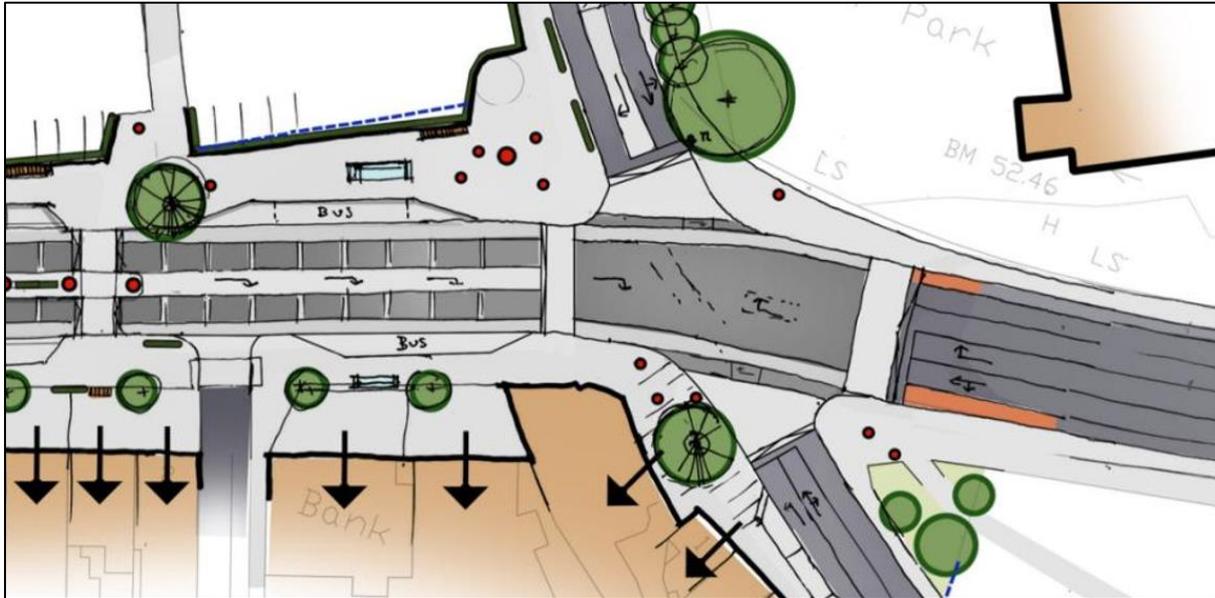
Future Junction Layout – The Hill / Lower Kilmacud Road / Old Dublin Road
